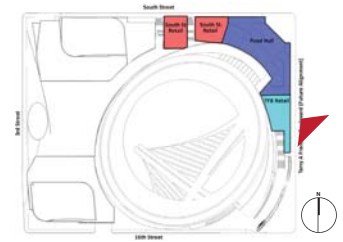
| FOOD HALL STOREFRONTS ON TERRY A FRANCOIS BOULEVARD LOOKING NORTH
